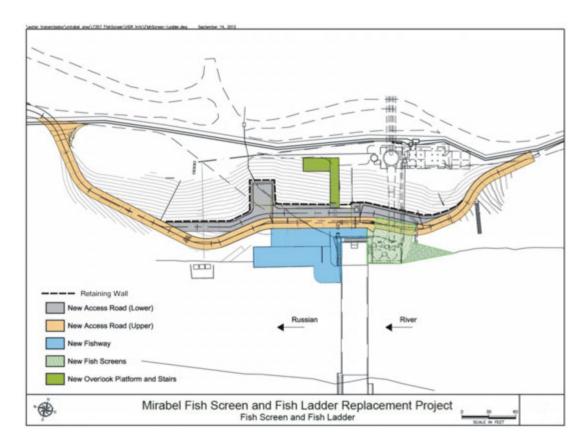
Conceptual plan view drawing of new fish screen and fishway structure at Mirabel.
